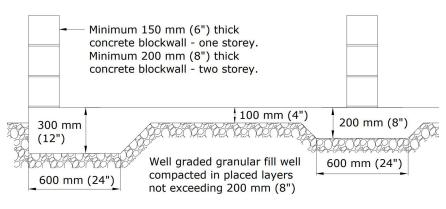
LAYOUT OF SLAB-ON-GROUND FOOTING
